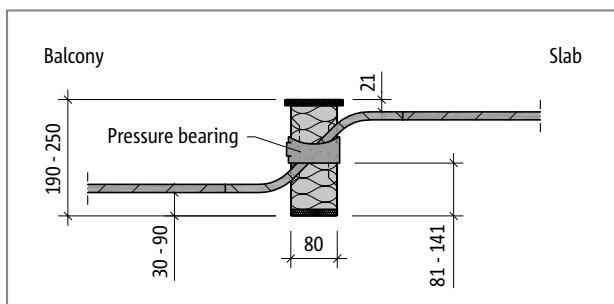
Schöck Isokorb® T type Q-E-V7: Product section
